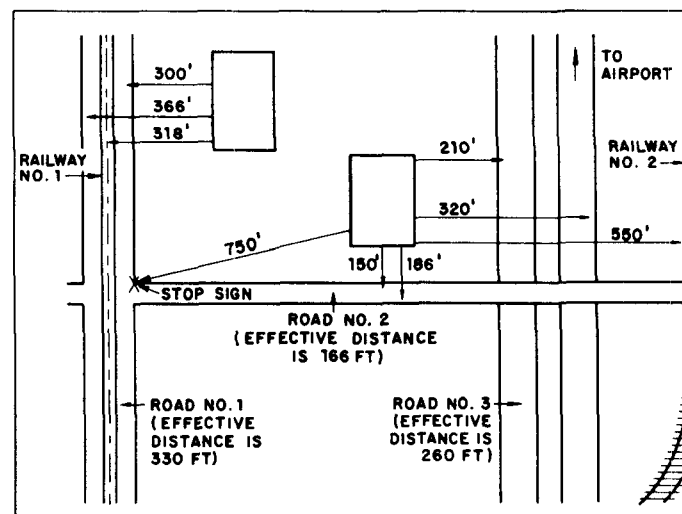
Plan view of site showing how distances should be measured from the location of the dwelling nearest to the source.
